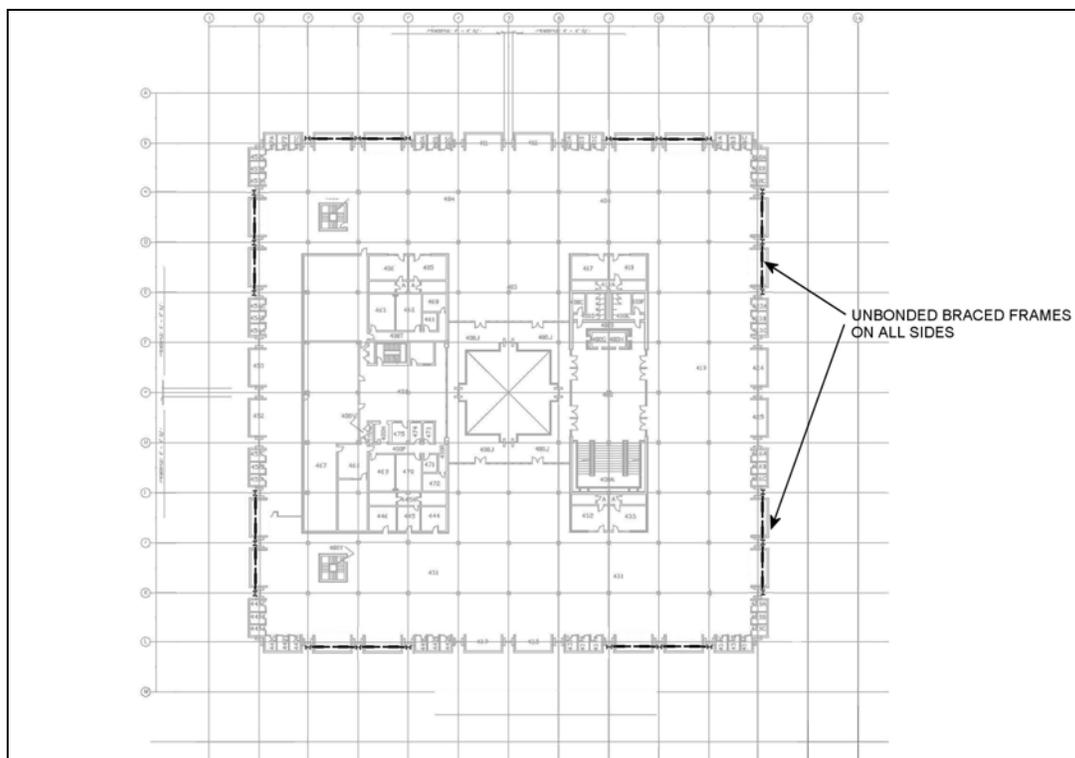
Recommended Layout of Unbonded Braced Frames, Levels 4,5.
